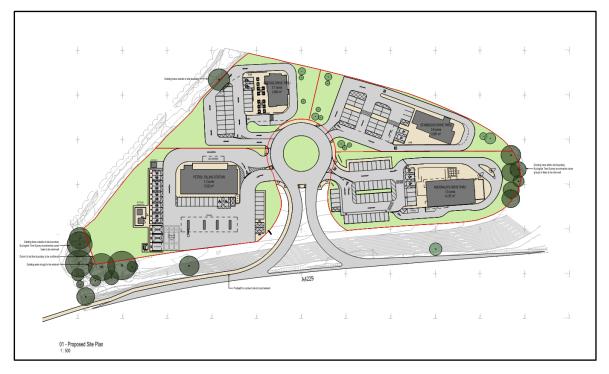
Proposed Site Plan (Lawray's Architect)
